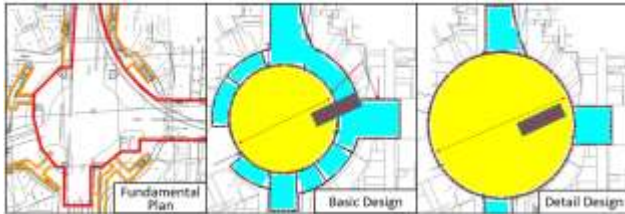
Layout of diaphragm wall for the fundamental plan, basic design, and detail design
